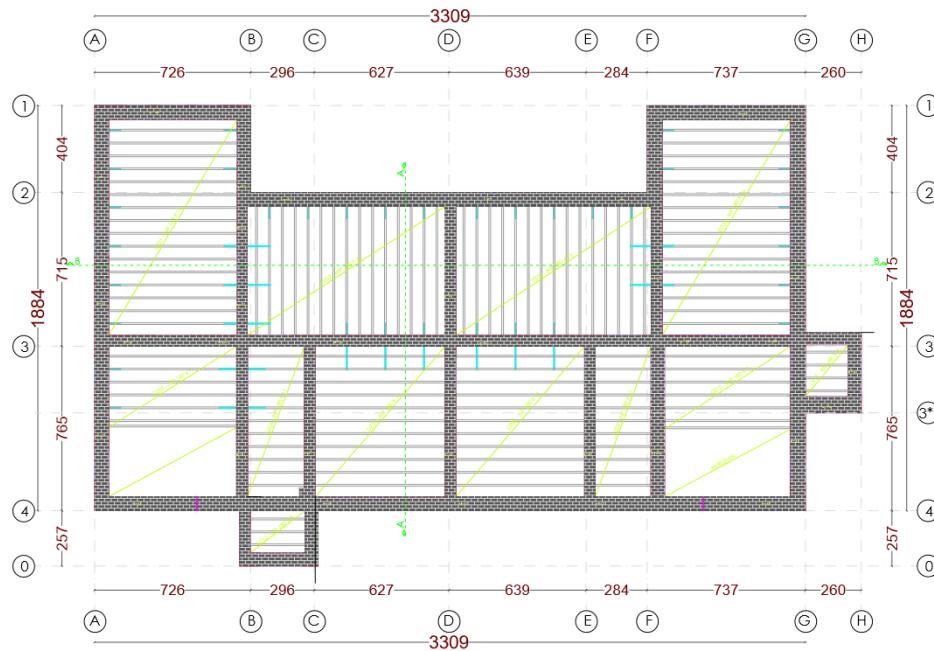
Plan of ground floor (dimensions are in centimetres).
